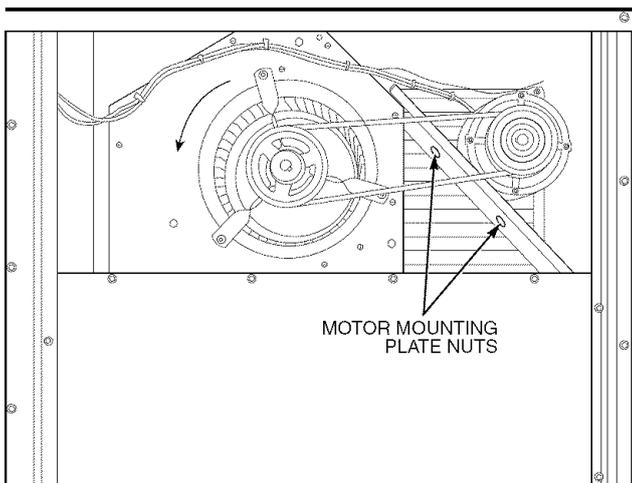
Typical Belt-Drive Motor Mounting for Sizes 008, 009
